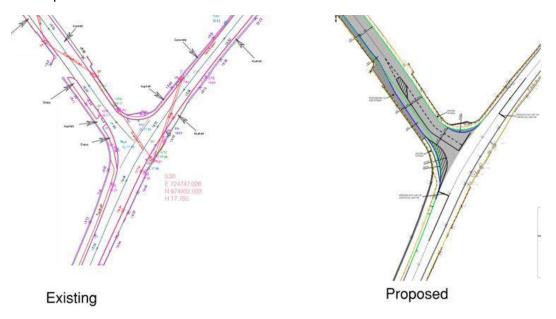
Existing and proposed Beech Road Junction upgrade works.
